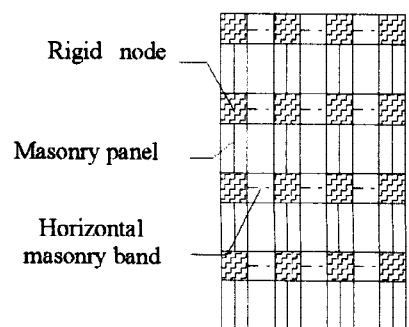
Schematization of the masonry wall as a frame; identification of horizontal masonry bands, panels and rigid areas.
